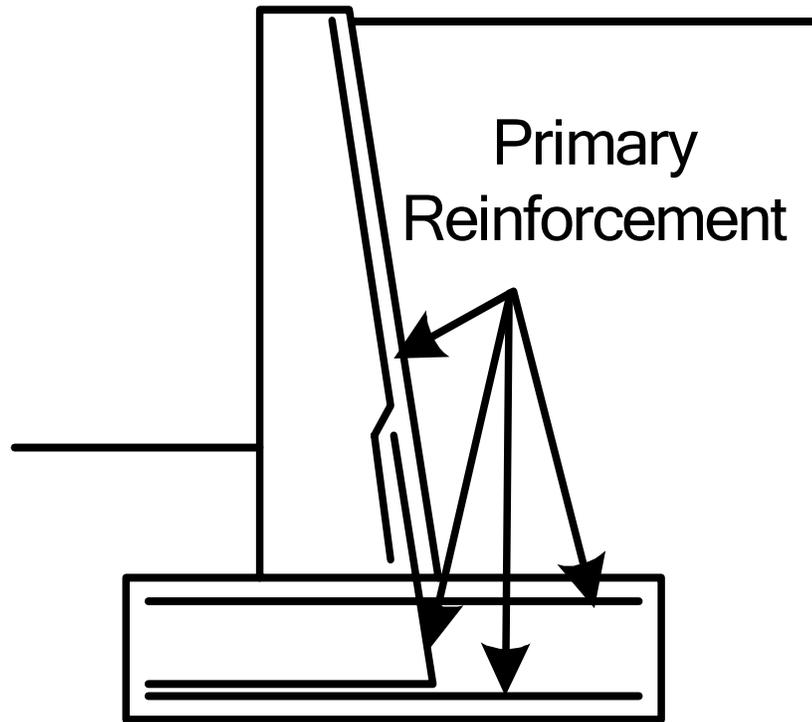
Primary Reinforcement in Concrete Cantilever Wingwall
